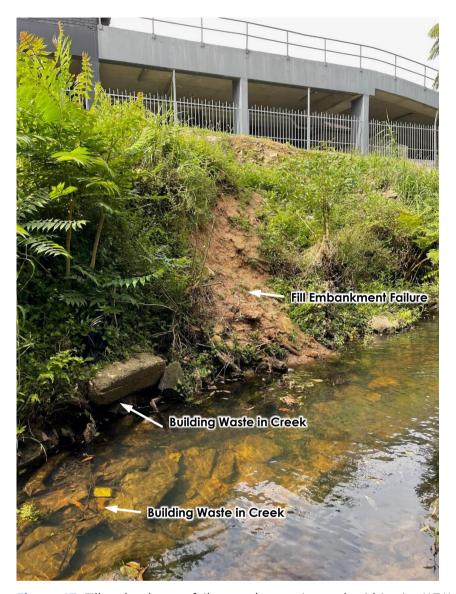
Fill embankment failure and waste in creek within site (17/11/2021).
